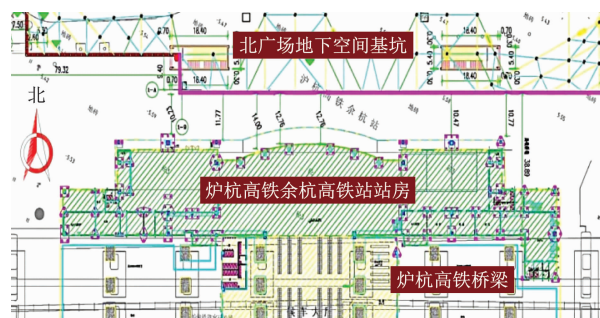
Layout of Yuhang High-speed Railway Station North Square underground space engineering plan
